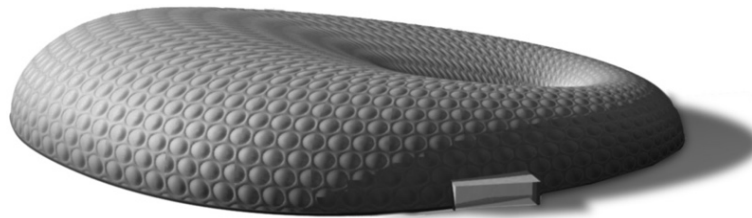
Membrane Concrete Grid Shells invented by Ing Zimmermann. (copyright Ing Zimmermann)
